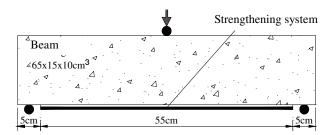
Flexural test: reinforced concrete beam strengthened with CFRP
